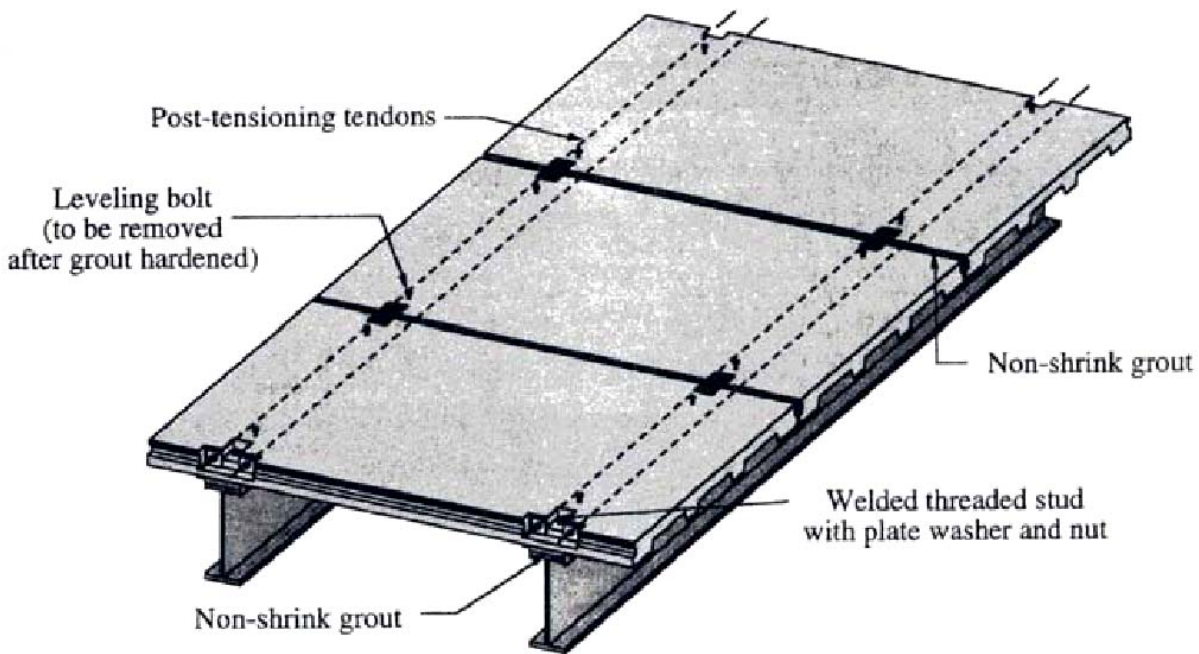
Typical Full-depth Precast Concrete Deck Panel Application on Steel Girders (Yamane et al. 1998)
